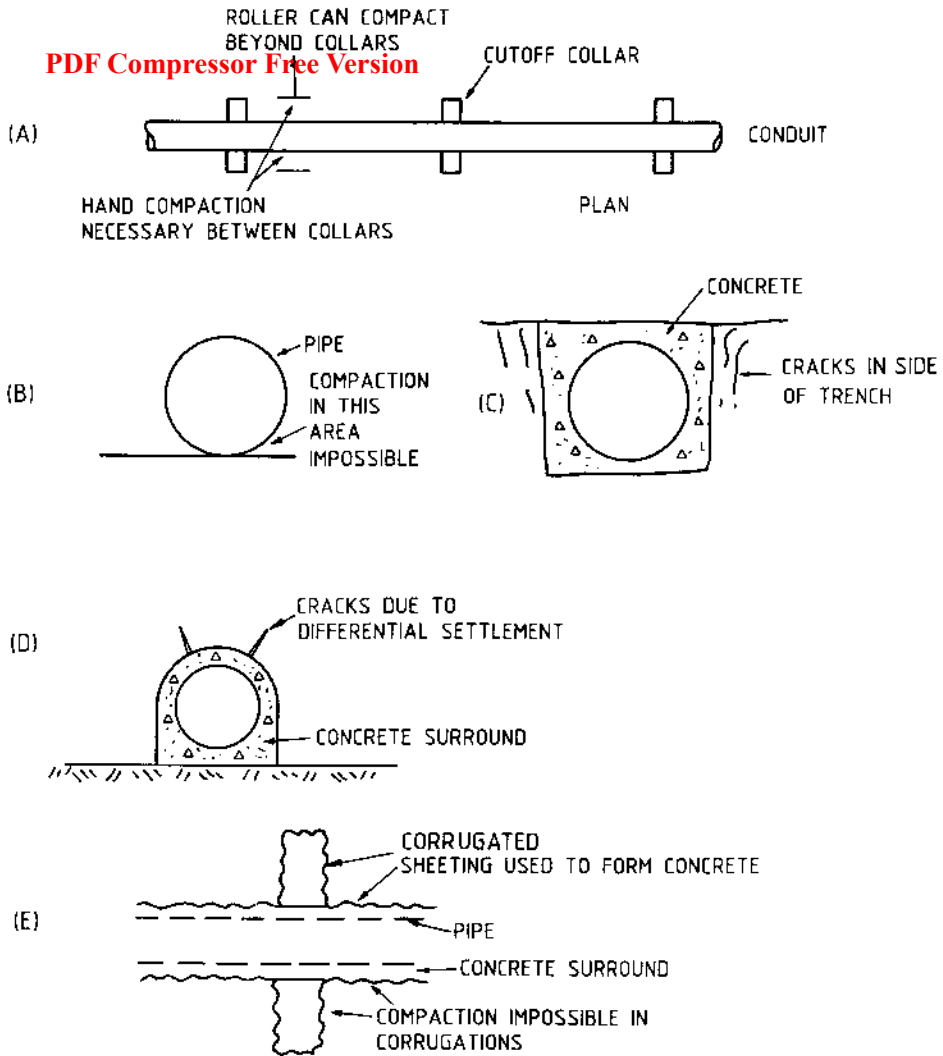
Some causes of piping failure around conduits; (A) Inadequate compaction due to the presence of cutoff collars; (B) Inadequate compaction under pipe; (C) Cracking in soil or extremely weathered rock in the sides of a trench; (D) Cracks due to differential settlement; (E) Use of corrugations or other roughening of the surface of cutoff collars or concrete surround.
